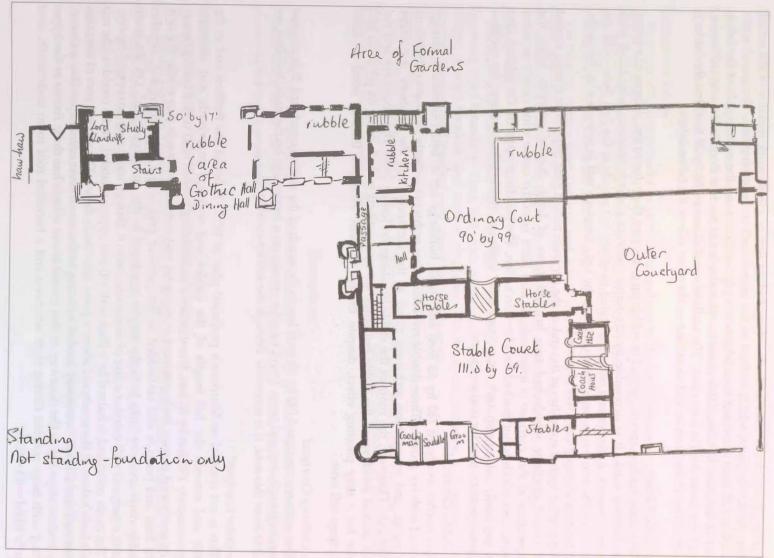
Thomastown Castle Ground Plan (based on Richard Morrison's Ground Plan I.A.A. 16/90RZ).
